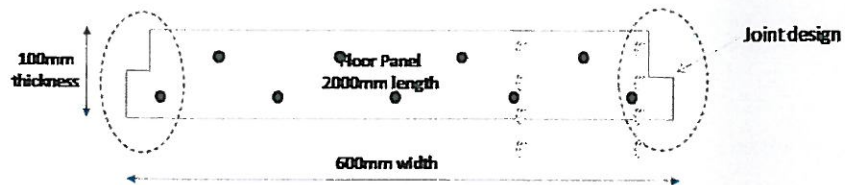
Joint Detail and Cross Section of ALC floor panel
